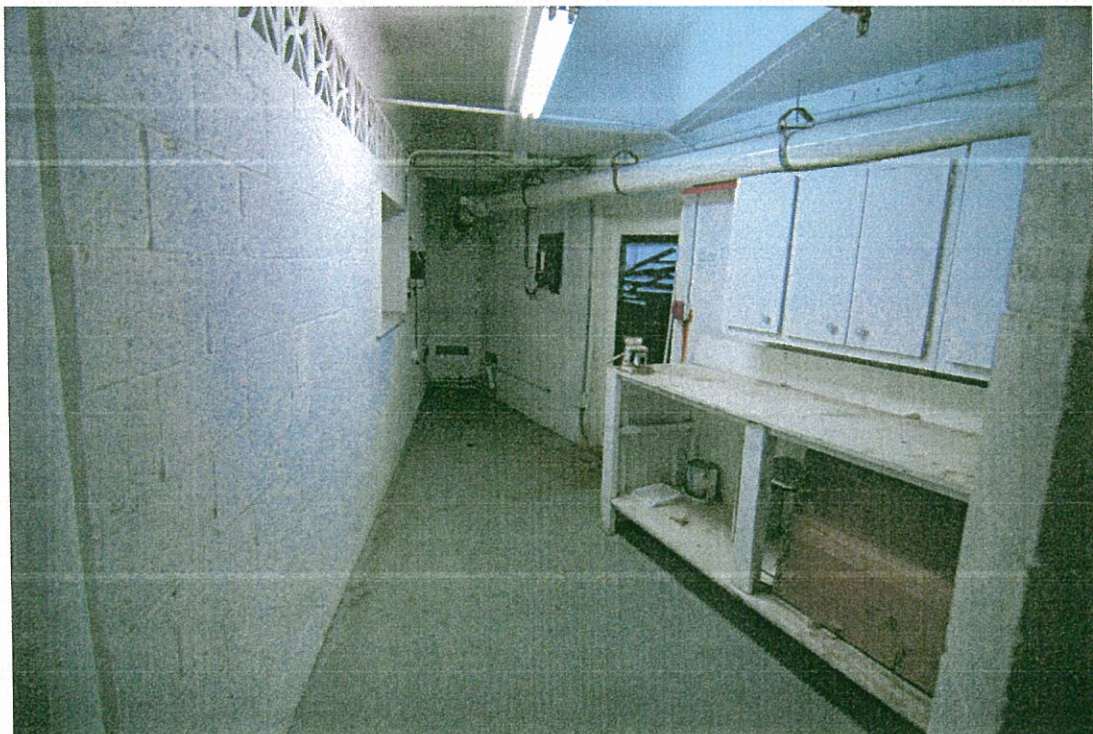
ALTERNATE VIEW OF ENCLOSED AREA AT ENTRANCE TO PARKING GARAGE ADJACENT TO NORTH END OF POOL AND DECK
